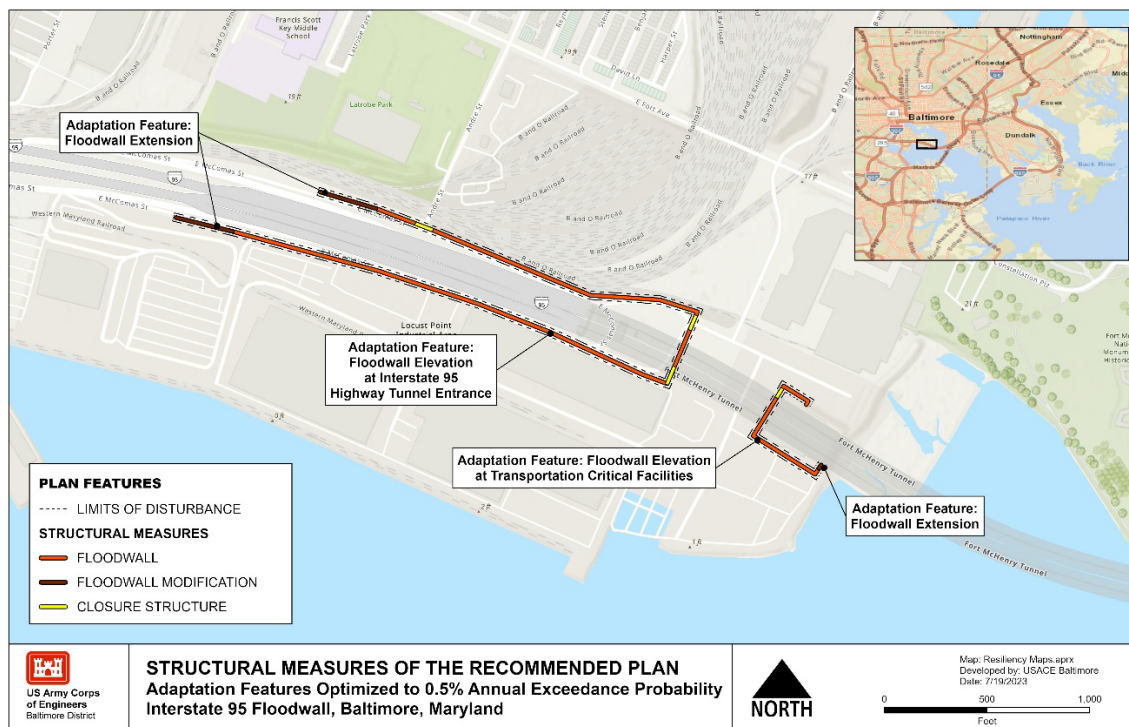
Structural Measures of the Recommended Plan at the I-95 Tunnel Optimized to 0.5% AEP
